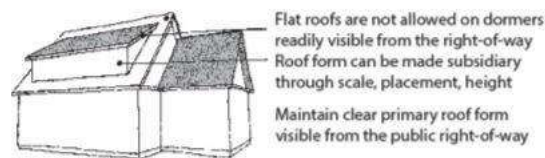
G: DORMERS AND SUBSIDIARY ROOFS
